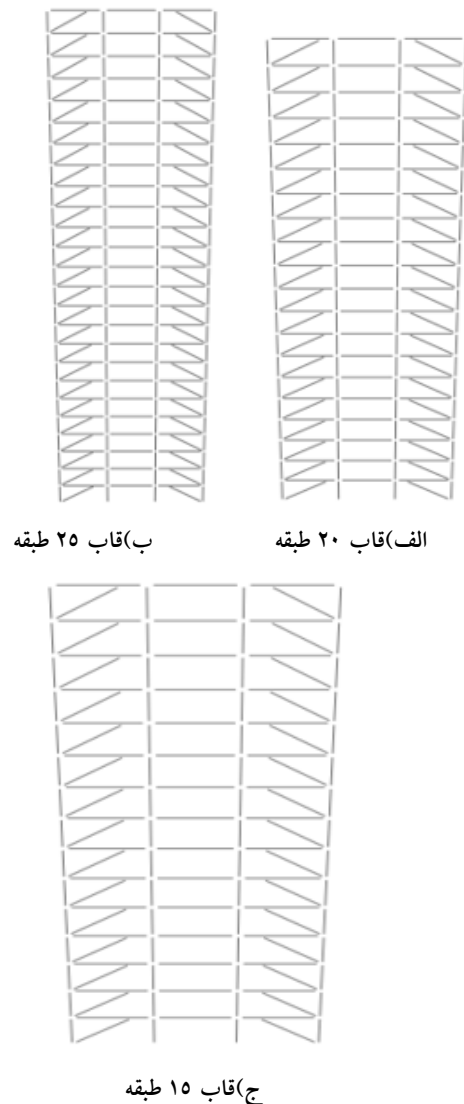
Two dimensional view of designed 15, 20 and 25 storey frames
